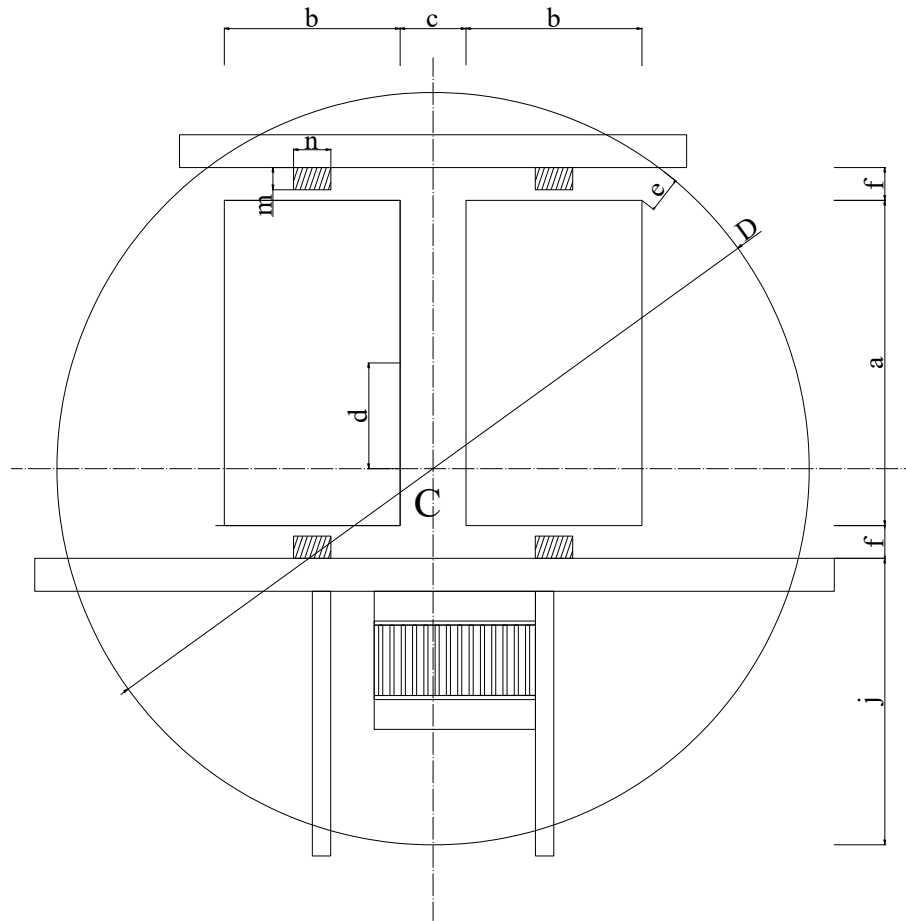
Shaft with a circular cross-section (two skips, pass-through section)
